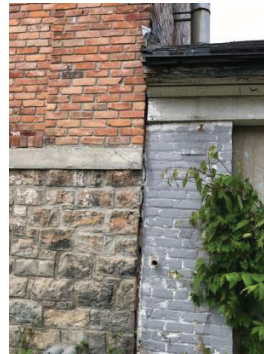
West Barn, where it connects to the "Barrel-Roof Building"
